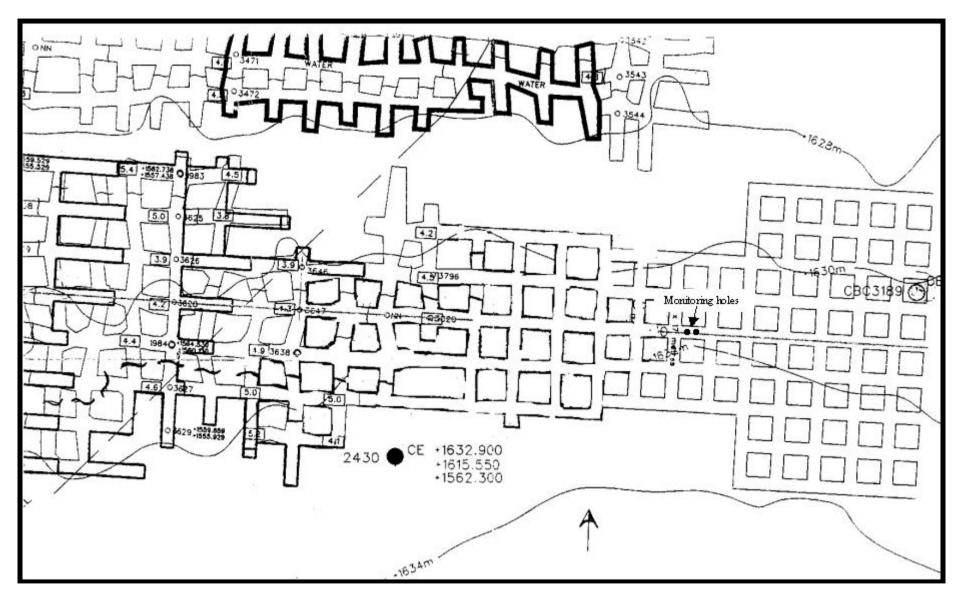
Section plan Colliery 'B' Site 1 (not scaled)
